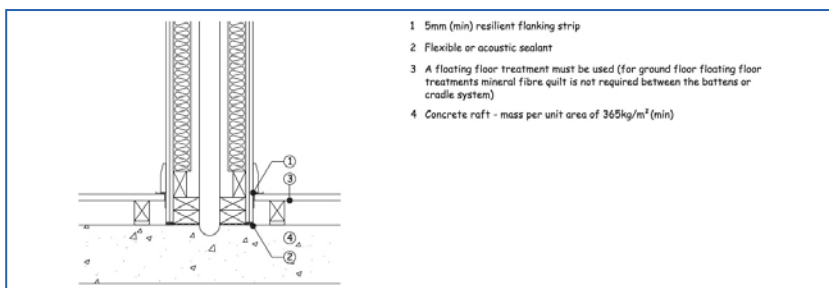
Cross section through a timber separating wall showing raft foundations. Flanking transmission paths via the ground borne slab are controlled through the use of floating floor treatments or from a full break in the slab detail.
